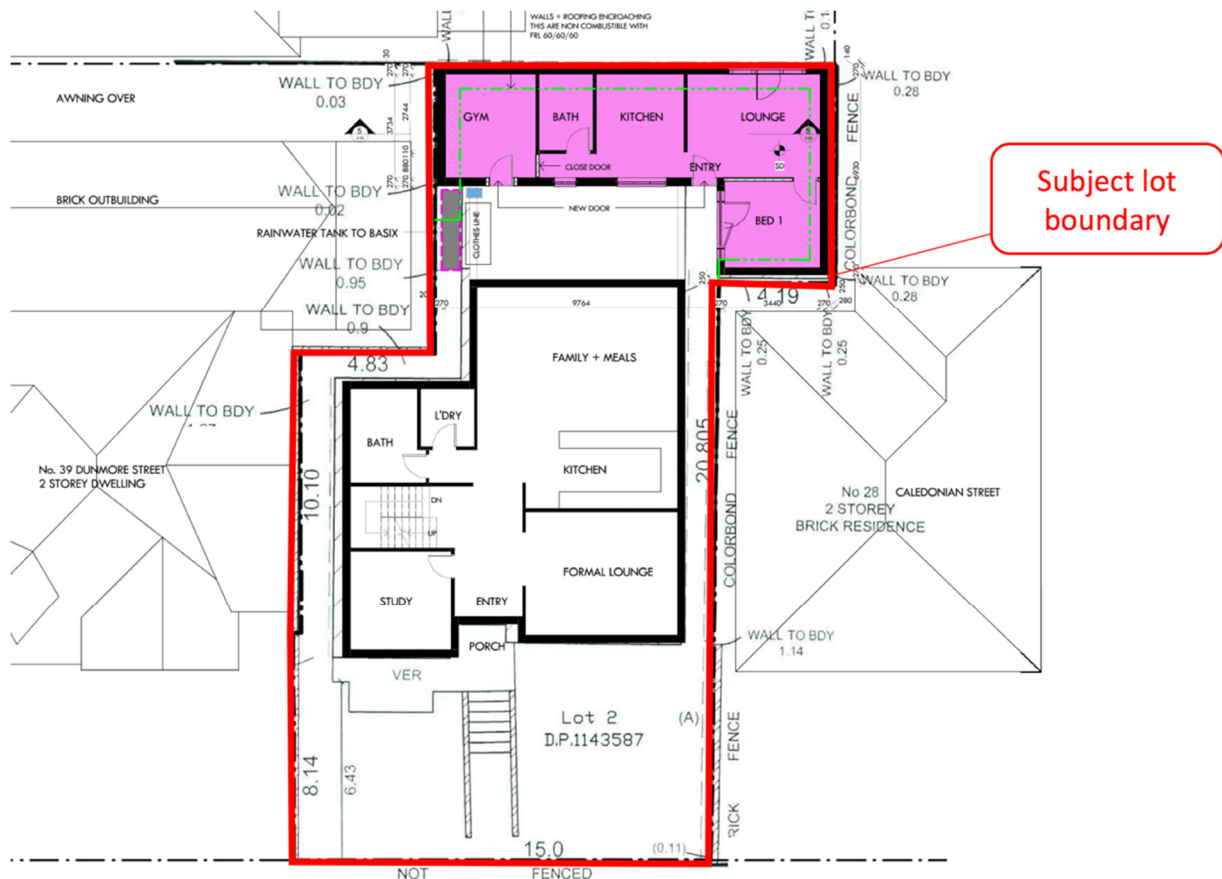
Proposed/existing rear structure, highlighted in purple, which is the subject of this DA.
